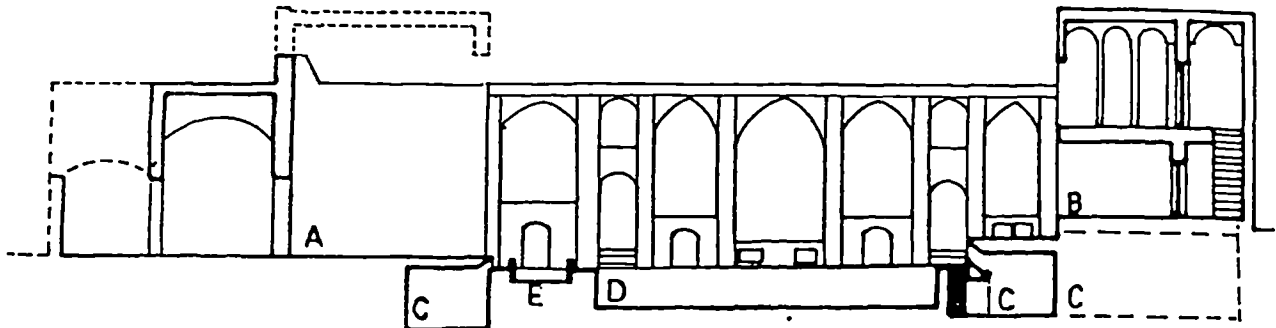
Reconstructed sectional elevation of the house of Immam Hussein, dating from the 15th century. A) winter portico B) Summer portico C) basement rooms D) sunken garden E) pool.
